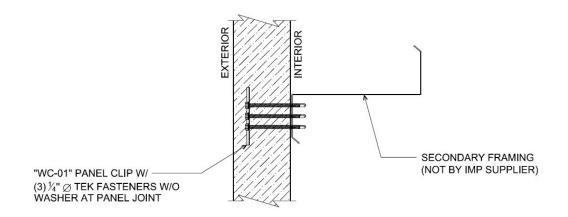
WALL PANEL JOINT WITH FASTENERS
